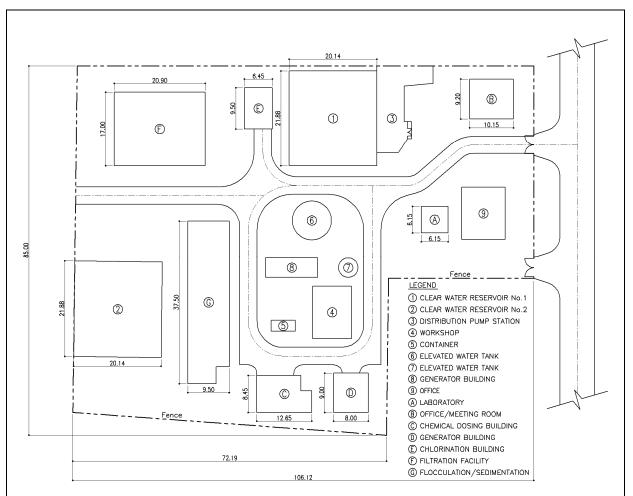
General plot plan of the Kampot Water Treatment Plant
